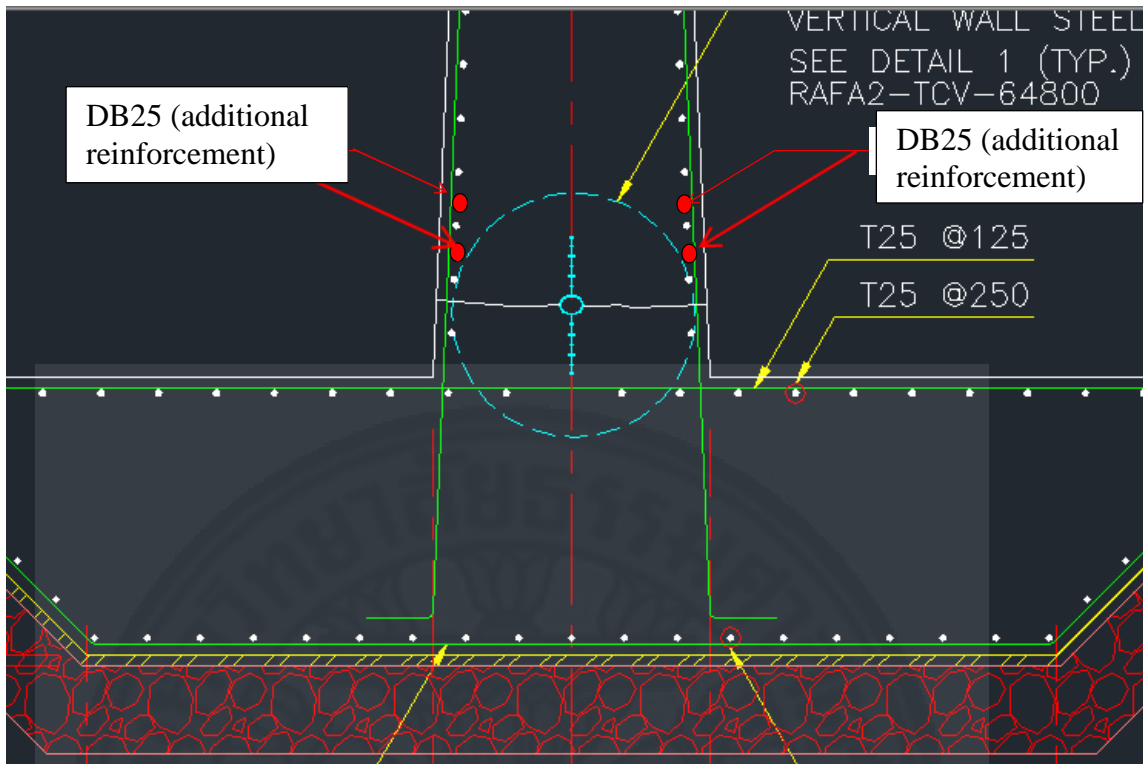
Placing locations of additional reinforcements to prevent shrinkage crack
